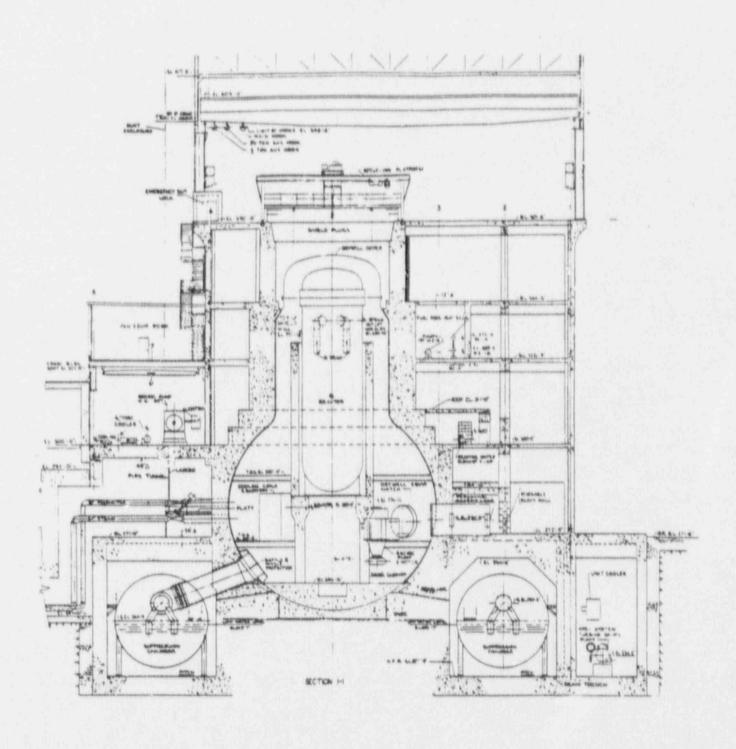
Fitzpatrick Reactor Building Elevation Views (page 1 of 5)
